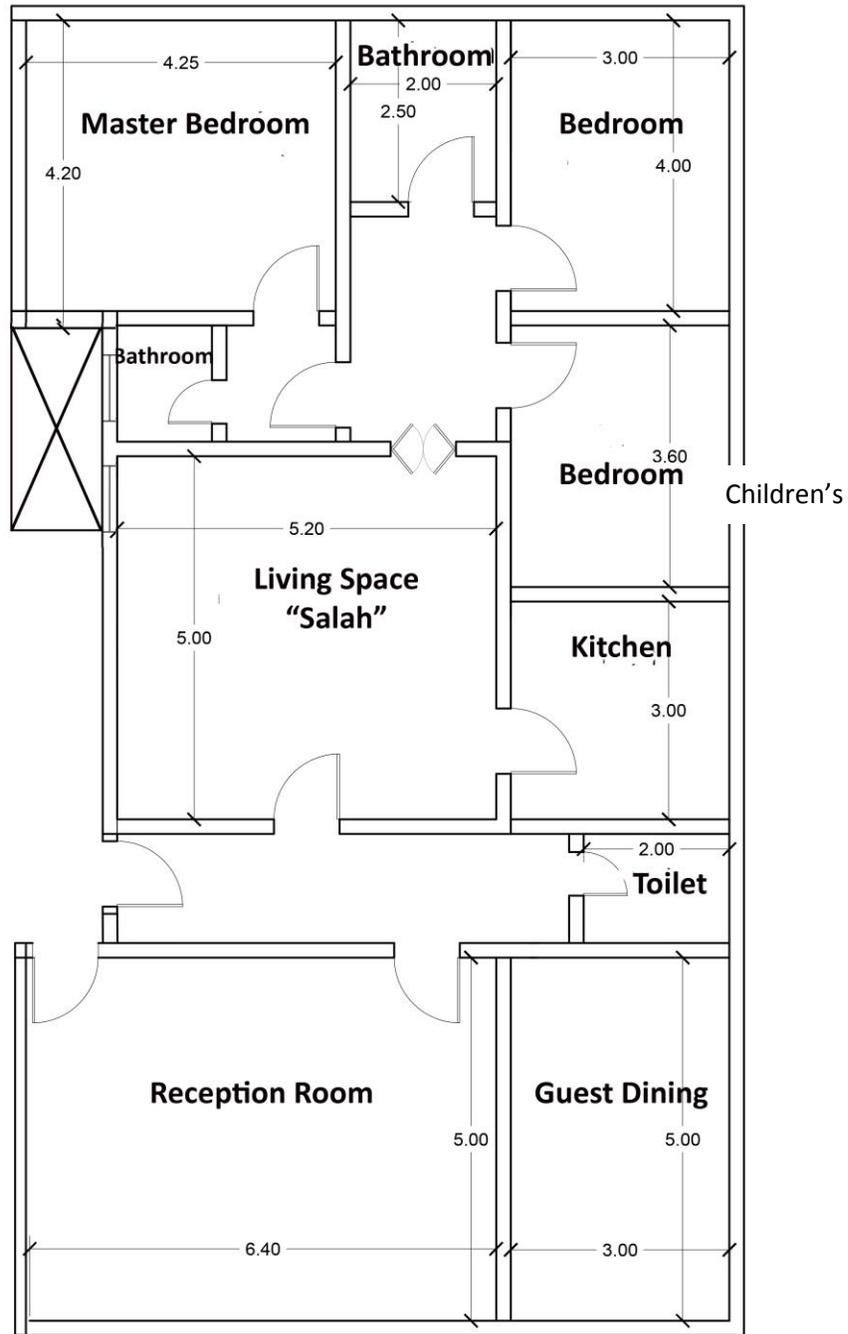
Sample 1 of common flat floor plan in Jeddah
